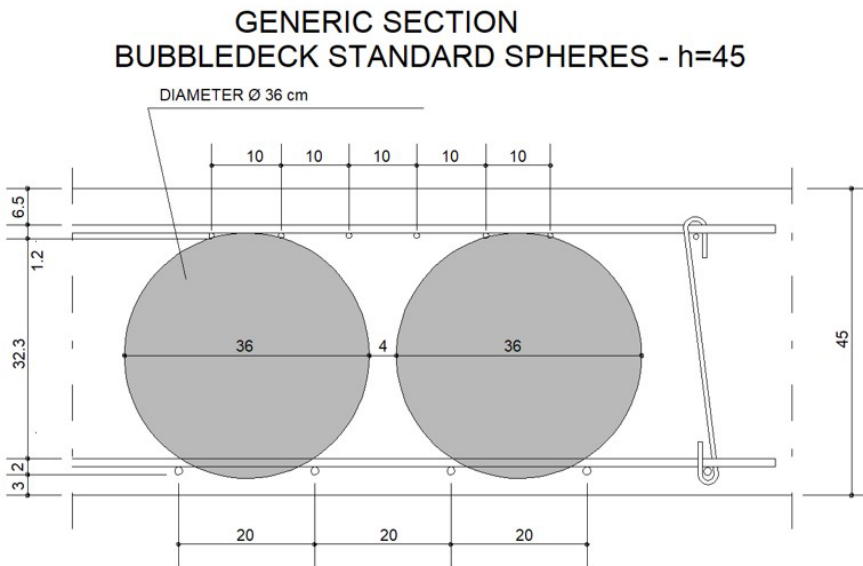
Detail of a generic section of the analyzed pavement, in centimeters.
